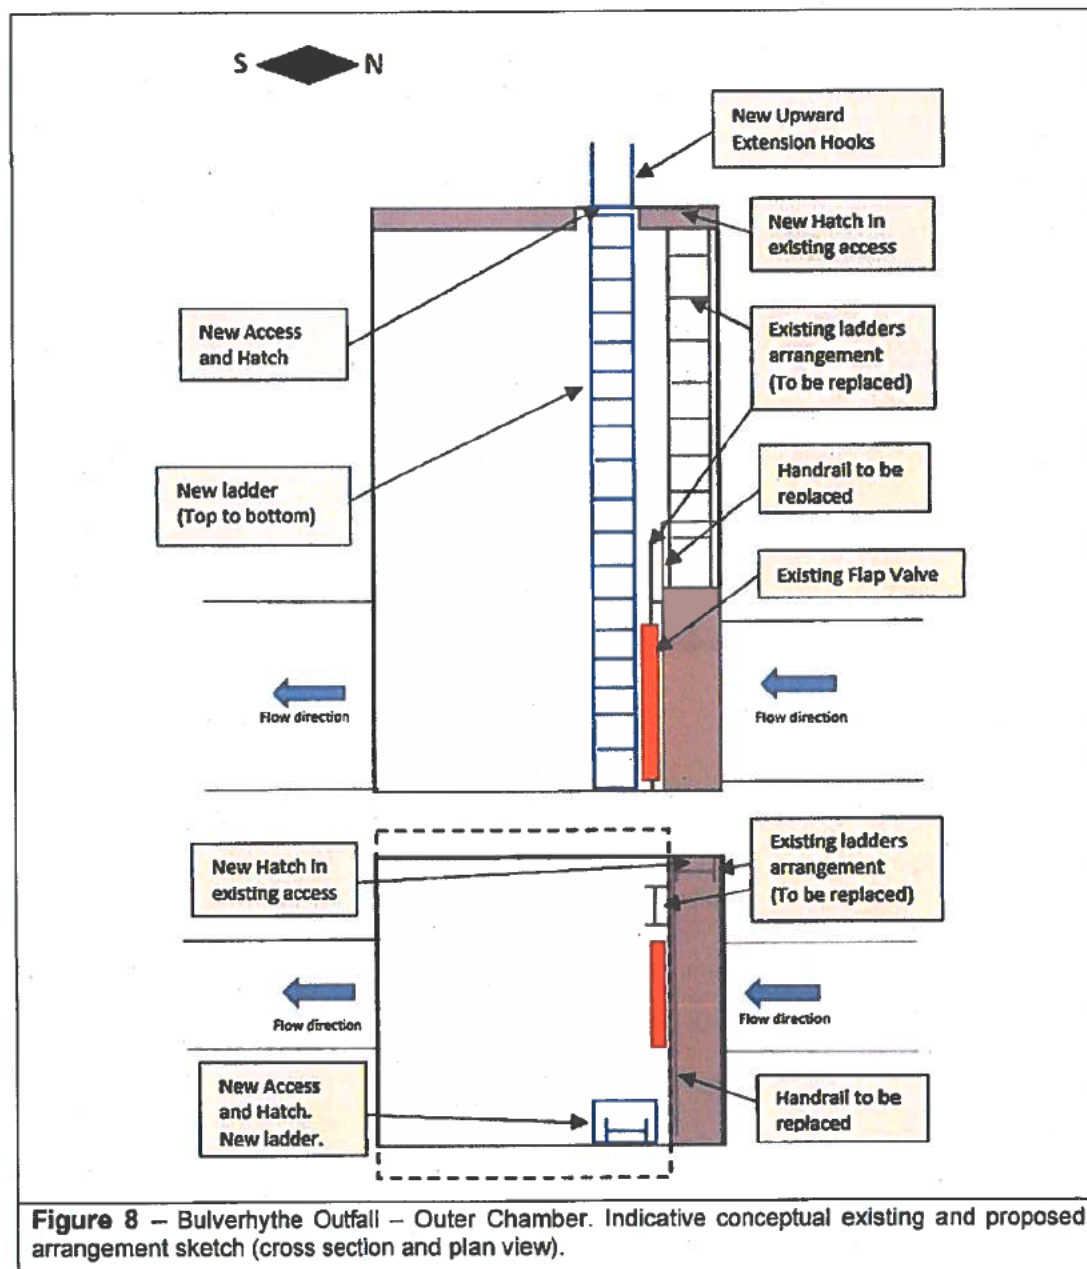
Bulverhythe Outfall – Outer Chamber. Indicative conceptual existing and proposed arrangement sketch (cross section and plan view).
